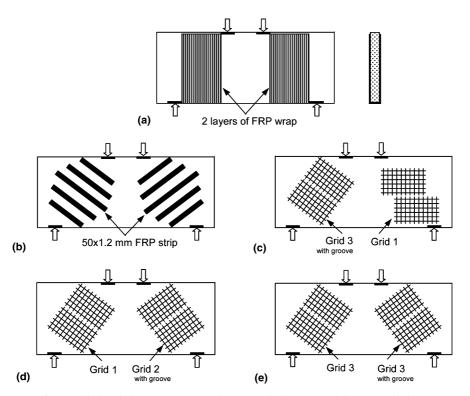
Arrangement of externally bonded FRP systems: (a) beam B1, (b) beam B2, (c) beam B3, (d) beam B4 and (e) beam B5.
